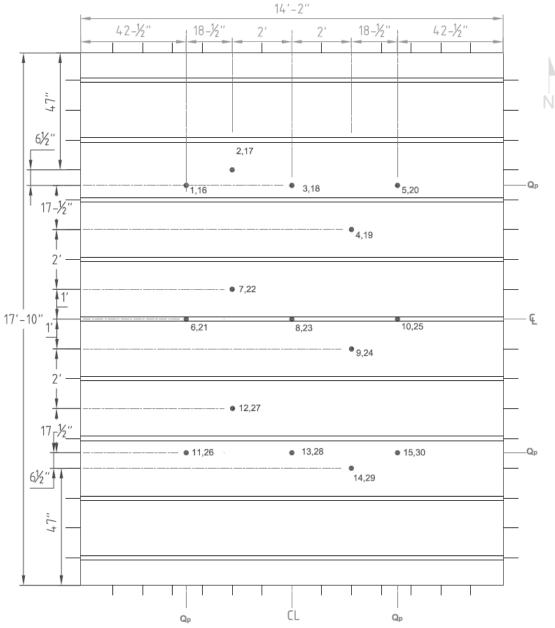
Thermocouple Locations on Subfloor and Carpet Padding.
